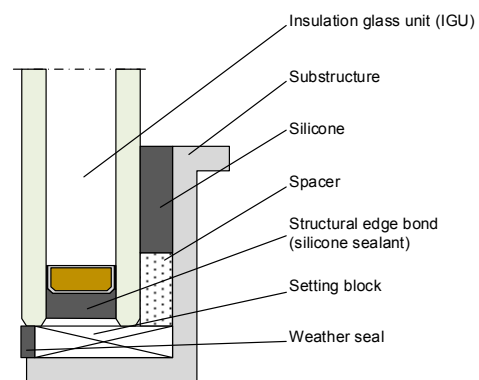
Structural sealant glazing system – insulation glass unit adhesively bonded to the building substructure (ETAG 002 2012)
